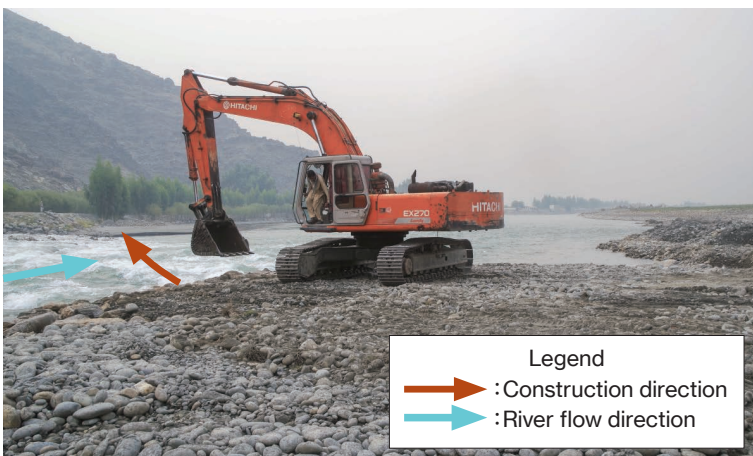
Construction of Temporary Road on the Top of Weir (Kama Weir I) ¹⁾ : October 31, 2018
